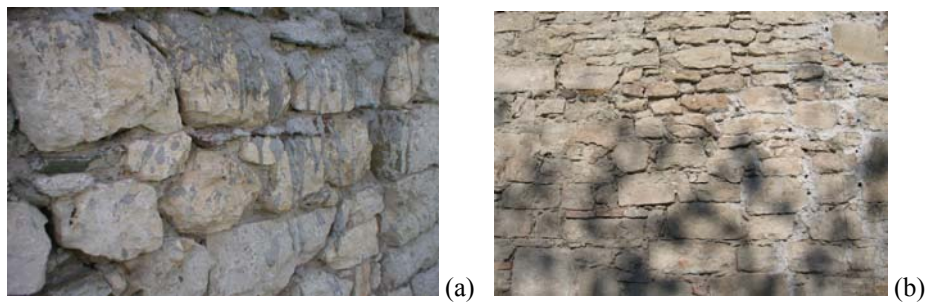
(a) Rough stone masonry with mortar; (b) Polygonal rough stone masonry
